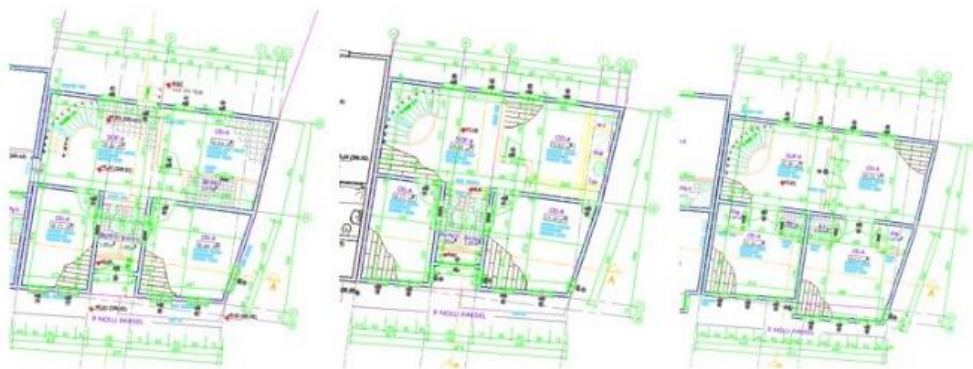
Basement and 1. and 2. floors plan of parcel number 9 (Scale:1/50)
